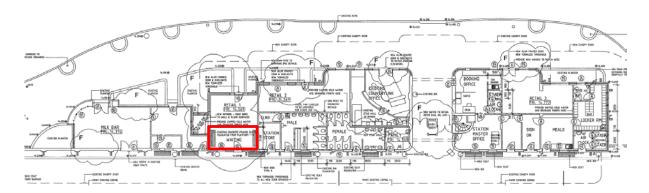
Location plan showing the storage room (Source: Sydney Trains Plan Room, 1994 alterations and addition, proposed floor plan).
